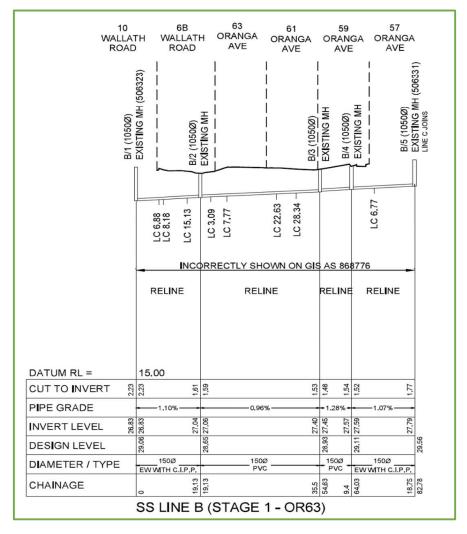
Wallath Road Sewer Longsection (OR63 Superlot)
